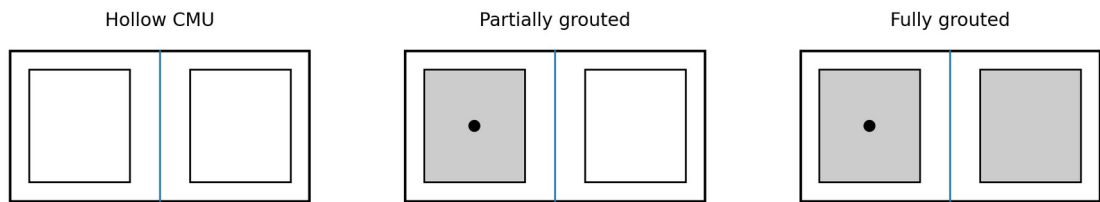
Hollow, partially grouted and fully grouted concrete masonry configurations. Author's original schematic. The visible wall can conceal materially different distributions of air, grout, reinforcement, mass and stiffness.
